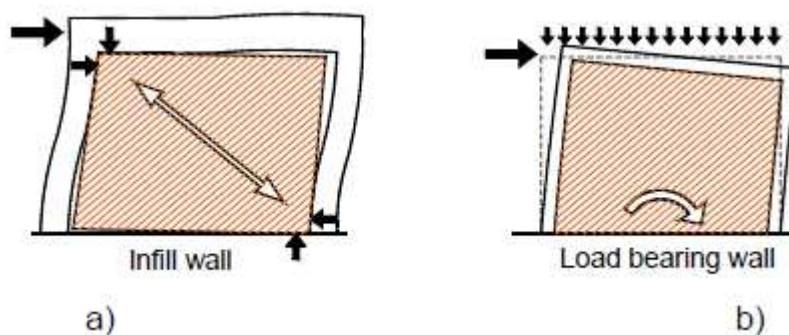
A comparison of RC frames with masonry infills (a), and confined masonry construction (b) (Meli, 2011)
